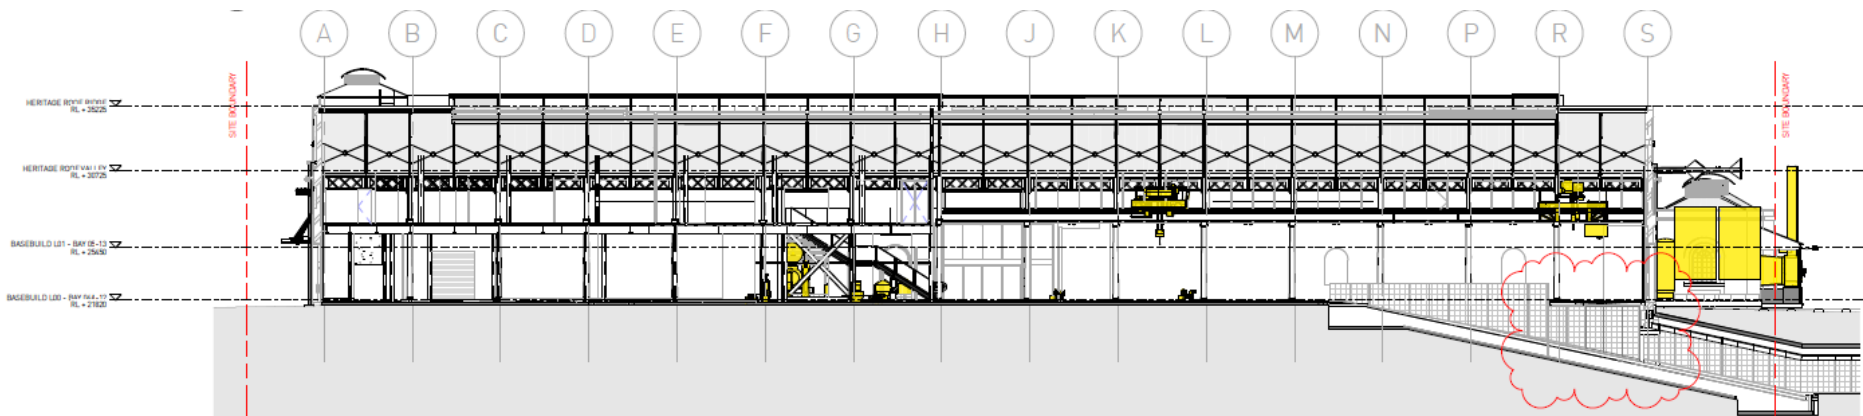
Proposed Cross Section – Bay 4 (Source: Sissons, 2019)
